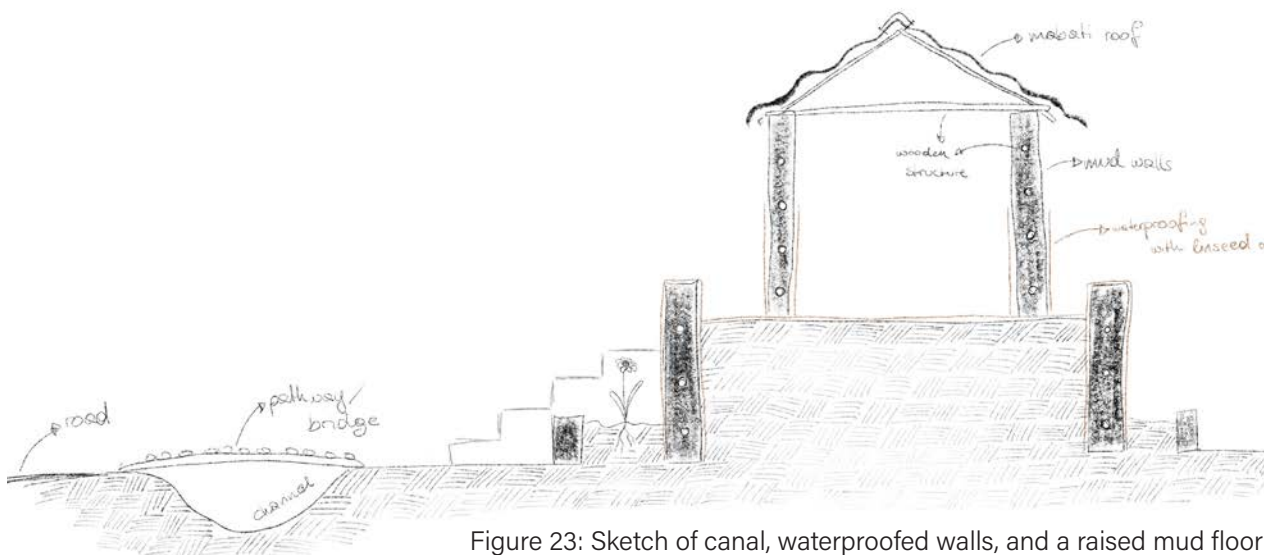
Sketch of canal, waterproofed walls, and a raised mud floor
